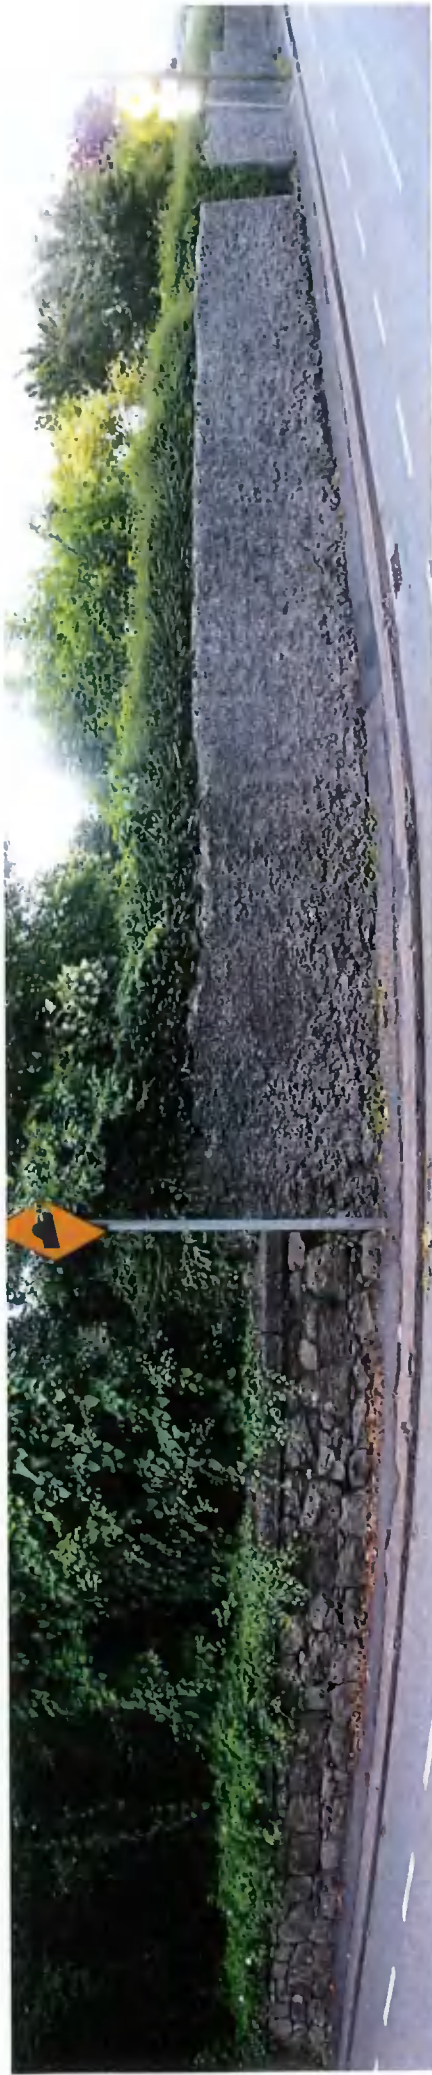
View of random rubble boundary wall to north west corner of site with pedestrian opening.
